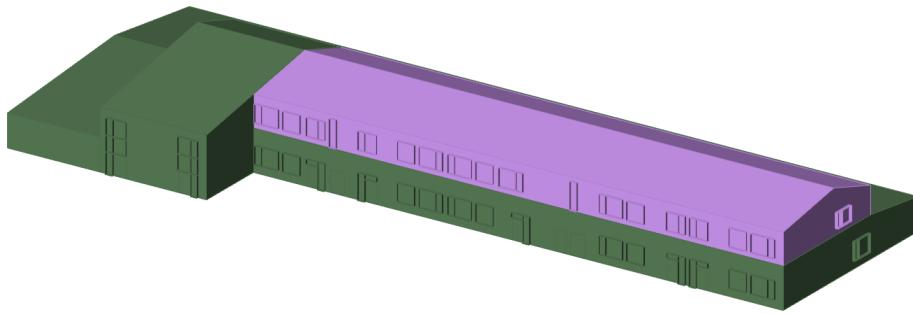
Grasshopper - Zoning. Zone 1 ground floor and zone 2 first floor
